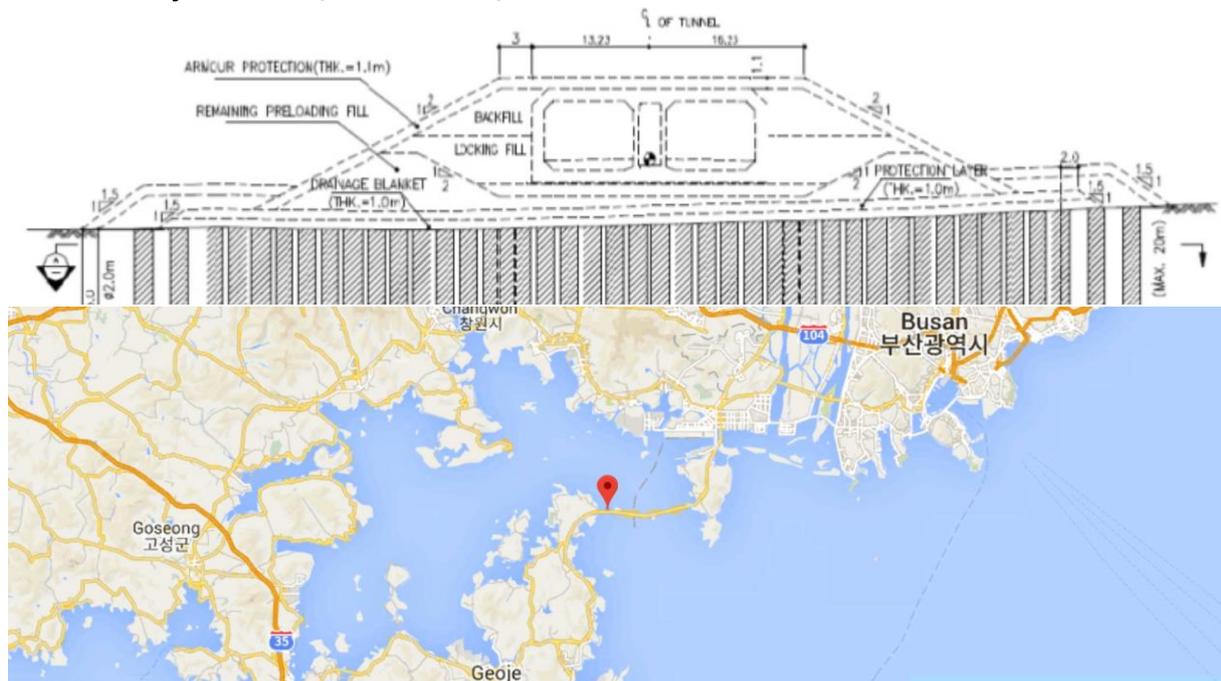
, BUSAN-GEOJE TUNNEL CROSS SECTION AND LOCATION
